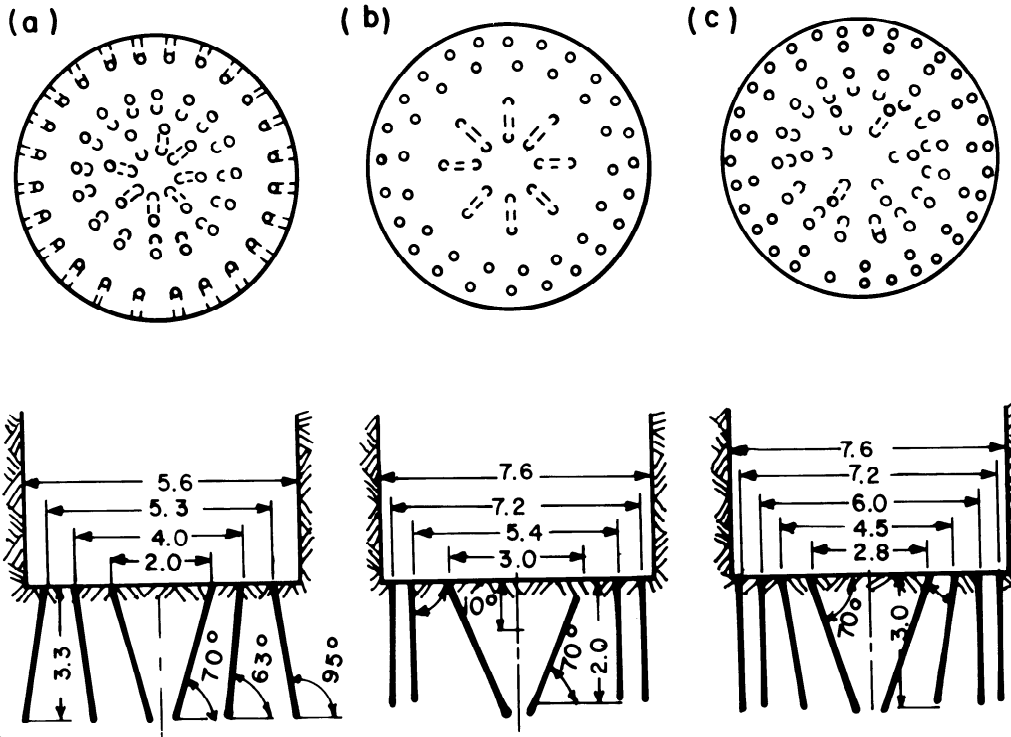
Examples of drillhole pattern in circular shaft.
